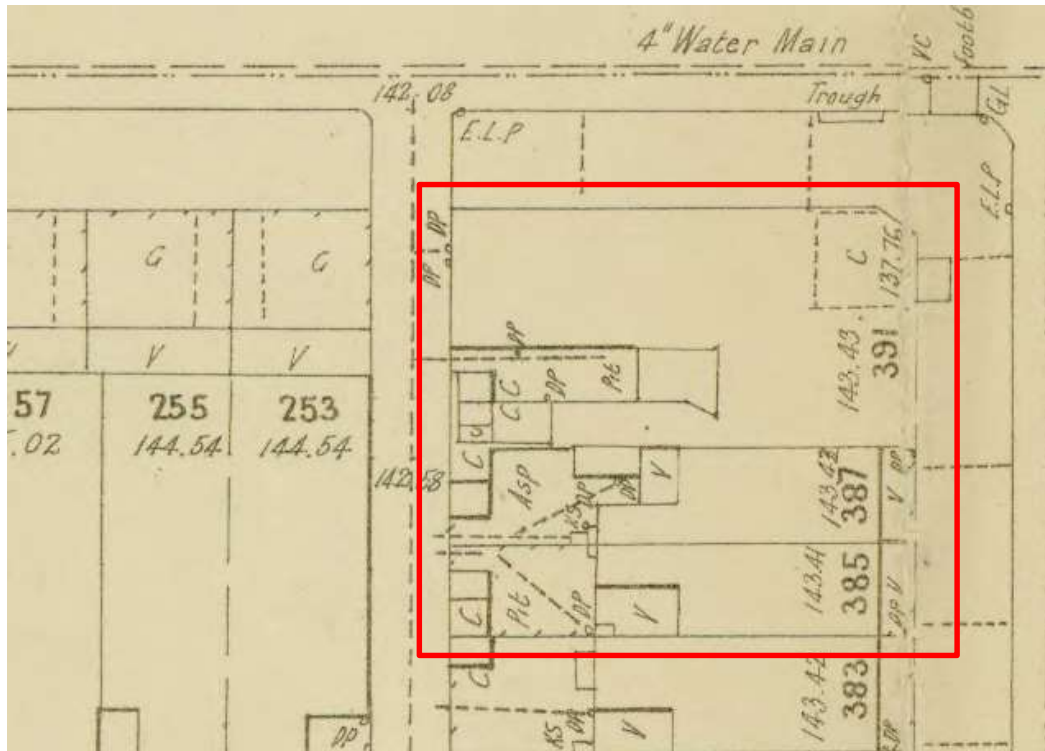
MMBW detail plan no. 1171, 1897, with hotel and houses in subject site indicated
